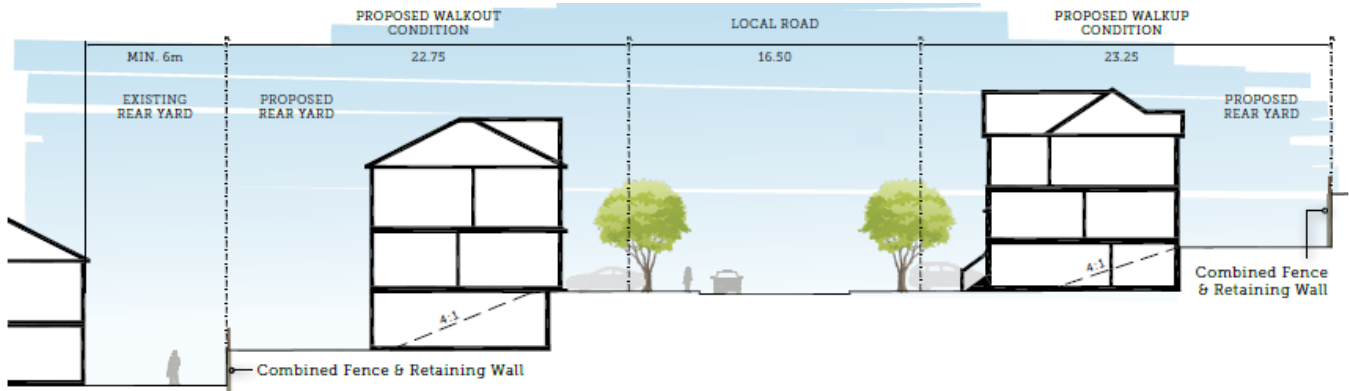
Cross Section of Walkout (Left) and Walkup (Right) Dwelling Conditions
